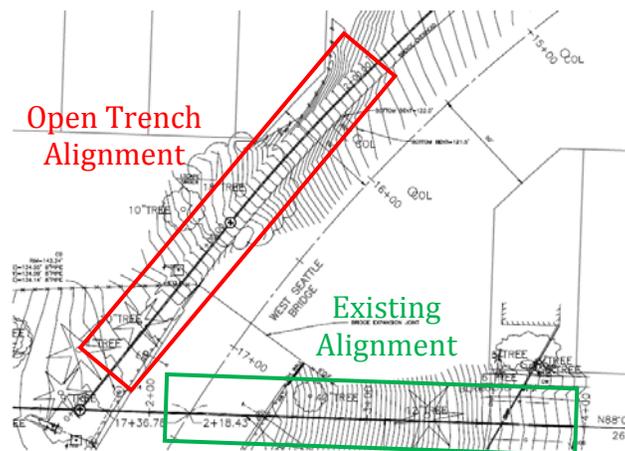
Open Trench Re-Route (Option One) – Plan View Snapshot.
